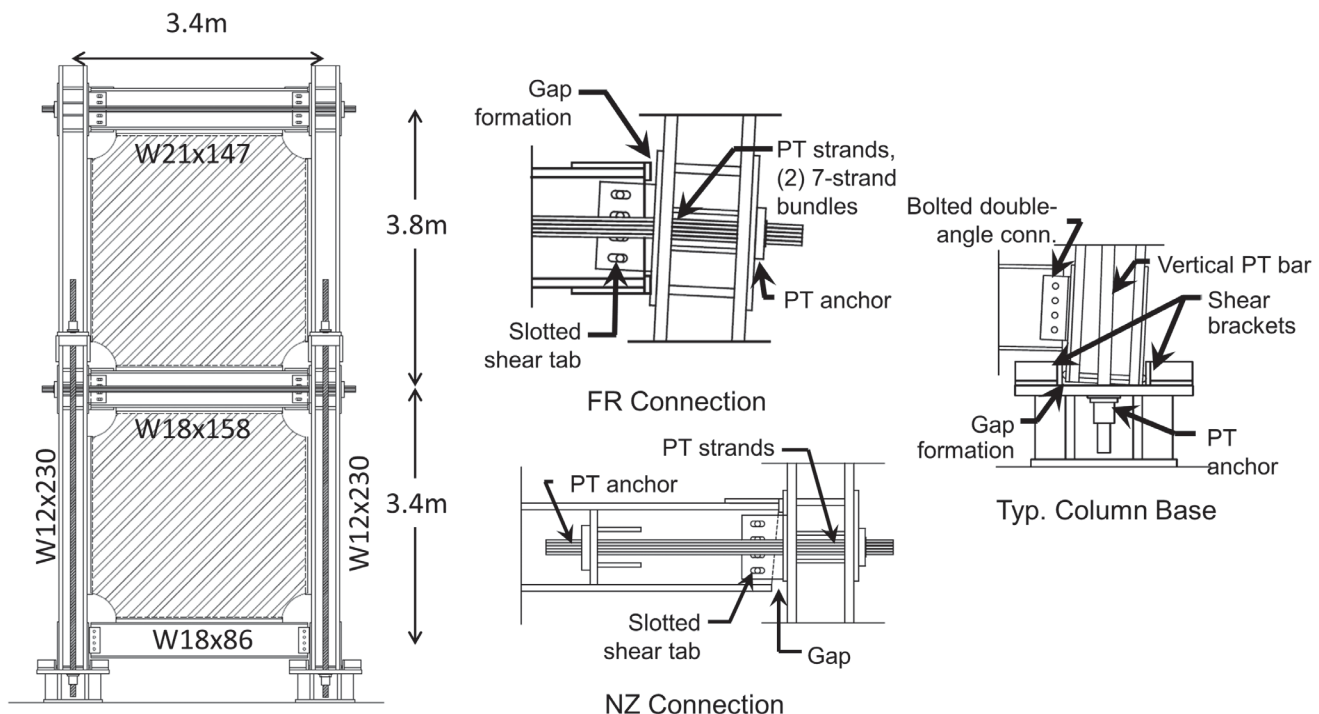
SC-SPSW specimen drawing with FR, NZ and column base details.
